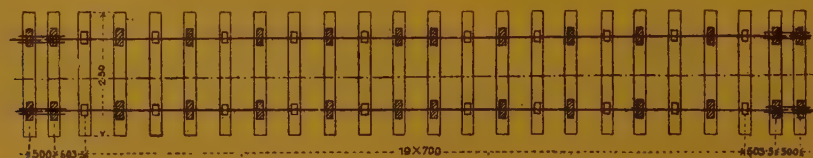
Type IV, for speeds of 105 and 110 km. (65 and 68 miles) per hour. 22 sleepers (maximum distance apart 70 cm. [2 ft. 3 9/16 in.]), 20 wedge-shaped sole-plates, 24 holding-down plates.
